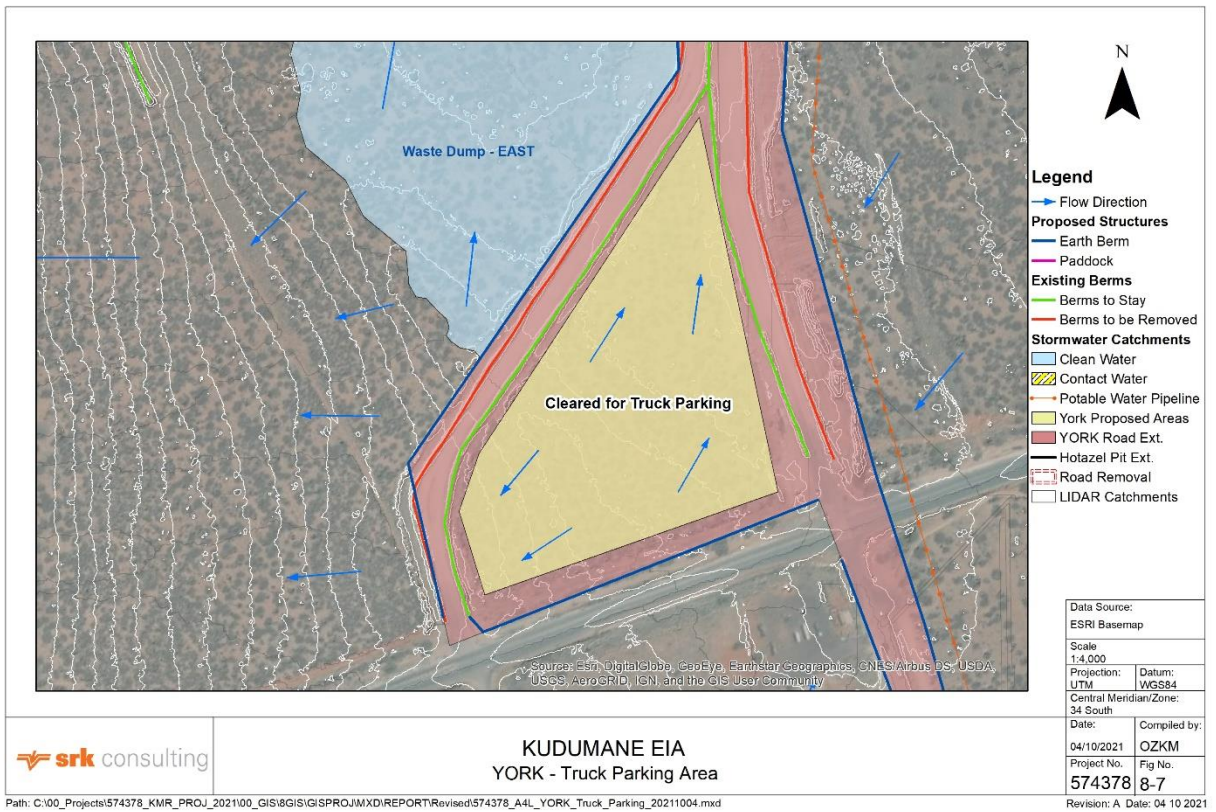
Proposed Stormwater Management Plan at York Truck Parking Area
